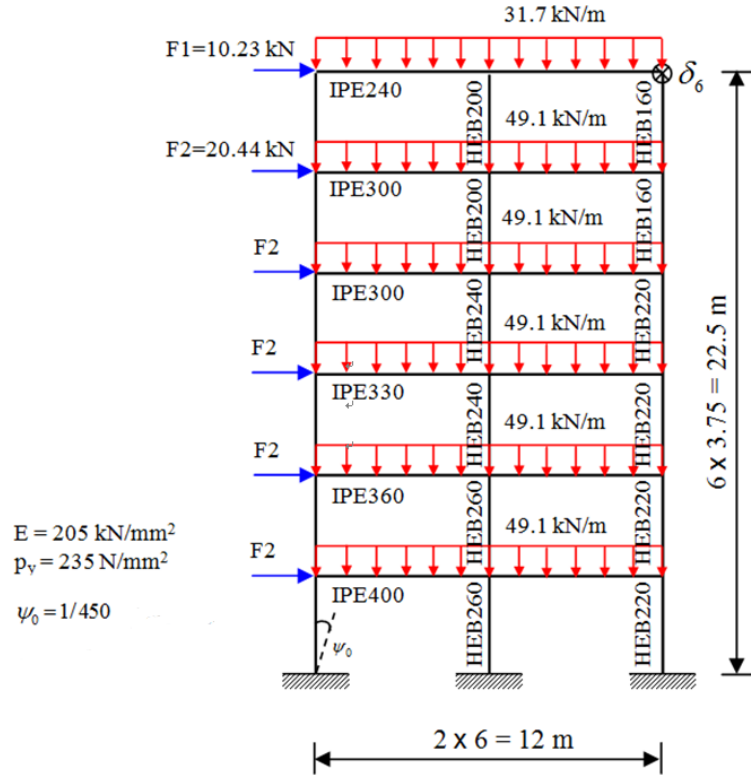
Layout and loading pattern of the Vogel's six-story frame
